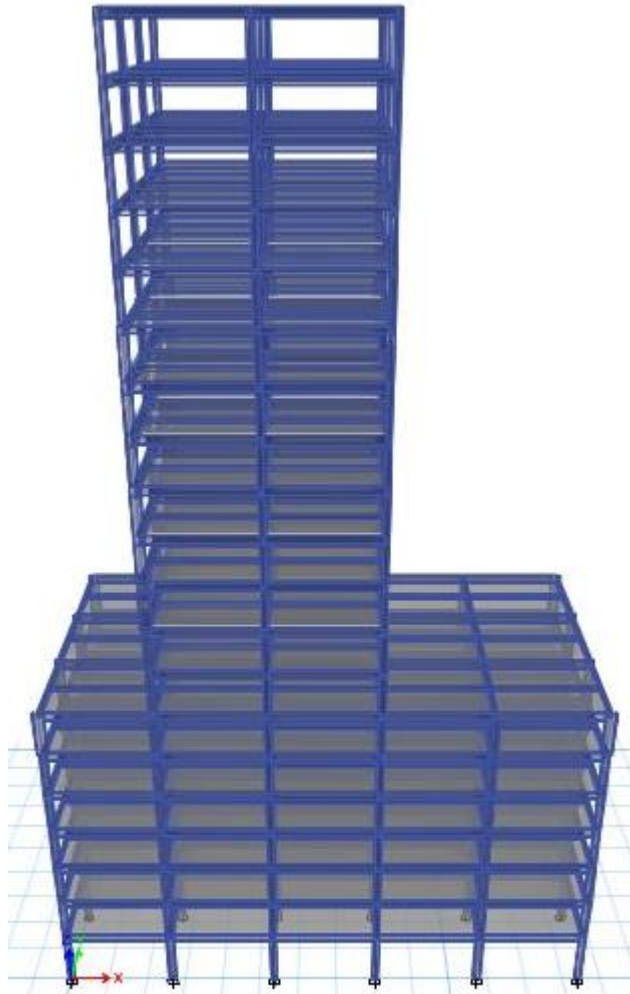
3D view of (2Rx1L) 20 story elevation
